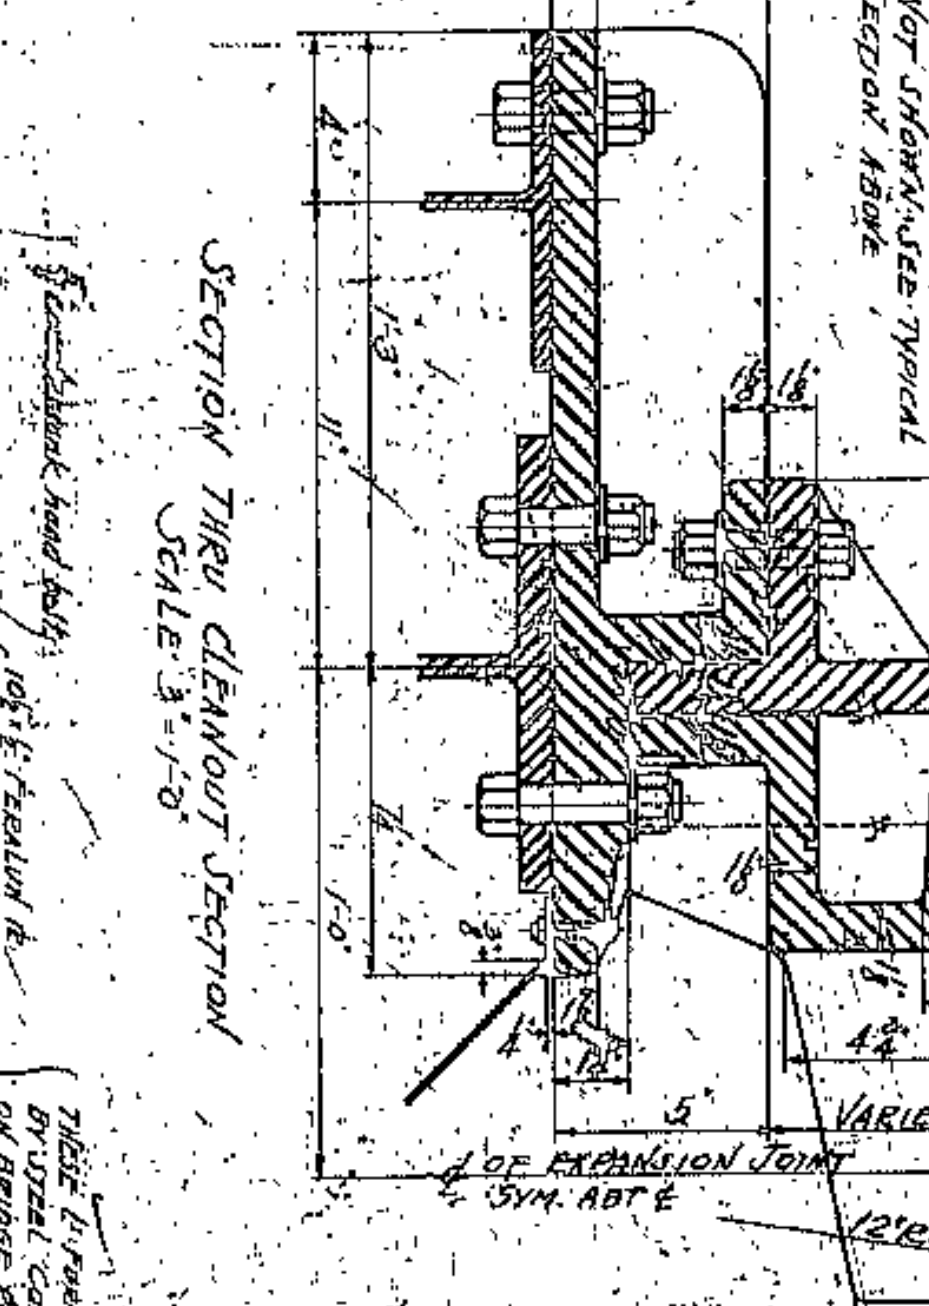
DETAIL OF REMOVABLE CLEANOUT SECTION CAST STEEL
